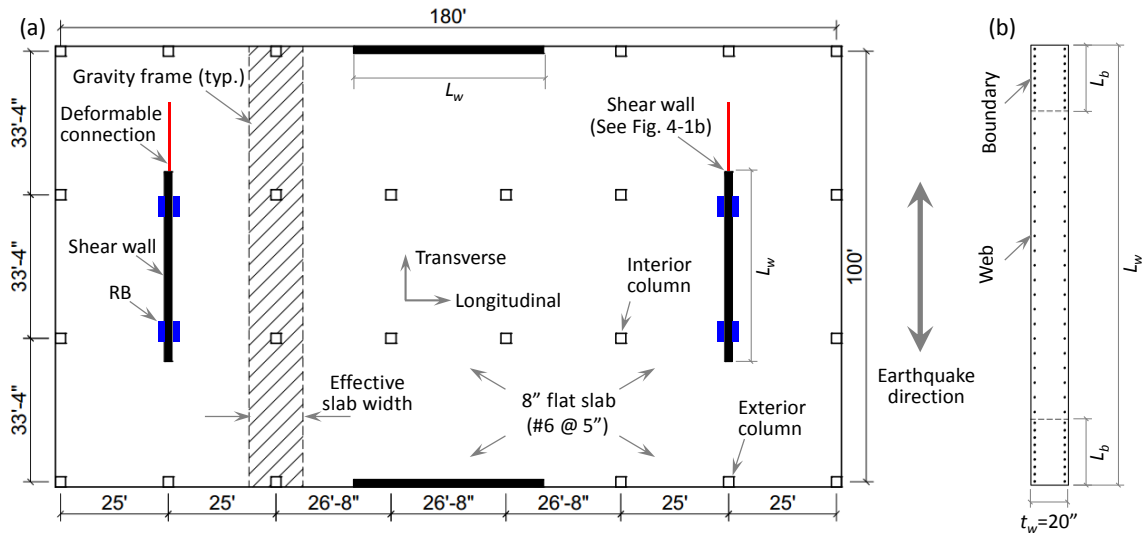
Plan view of evaluation structure: (a) floor plan; (b) shear wall cross section.
